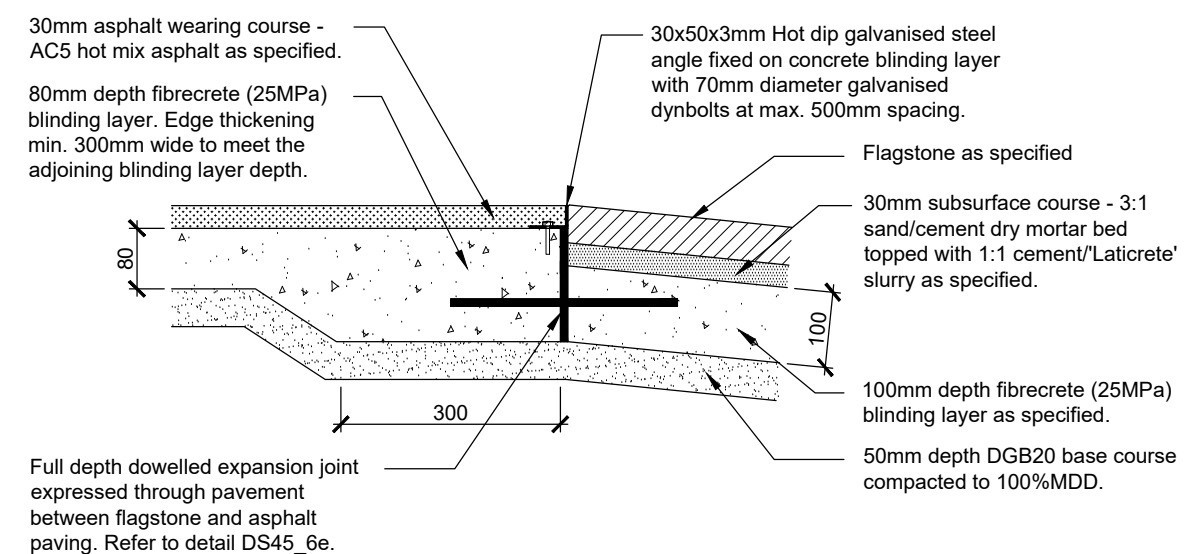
Typical Footpath Cross Section_Secondary Granite Treatment
